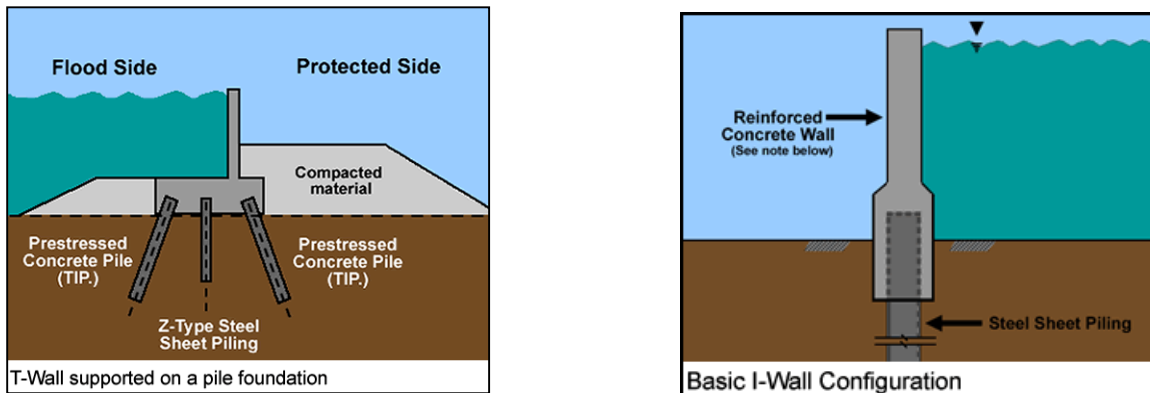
Basic Types and Details of Floodwalls: T-Wall and I-Wall (<http://library.water-resources.us/docs/MMDL/FLD/Feature.cfm?ID=2>)
